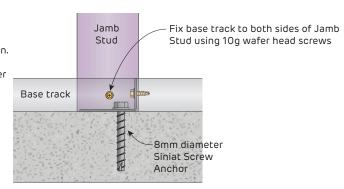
Base Connection BC4 for Prefabricated Door Frames Elevation
